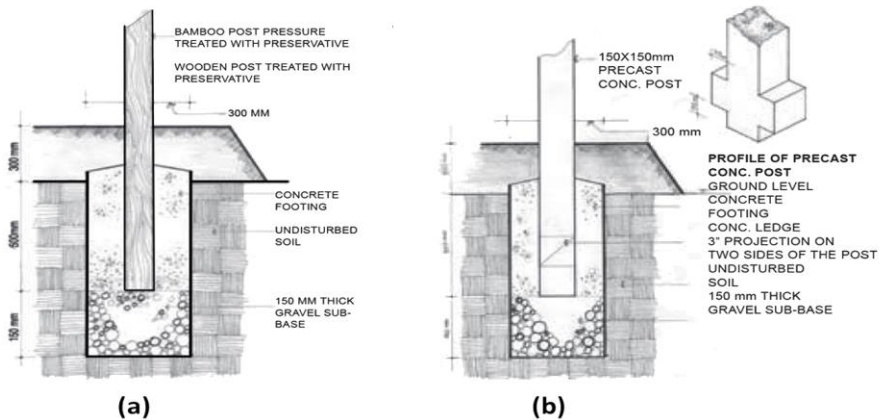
(a) Typical footing for timber and bamboo posts, (b) Typical Footing for precast concrete post
